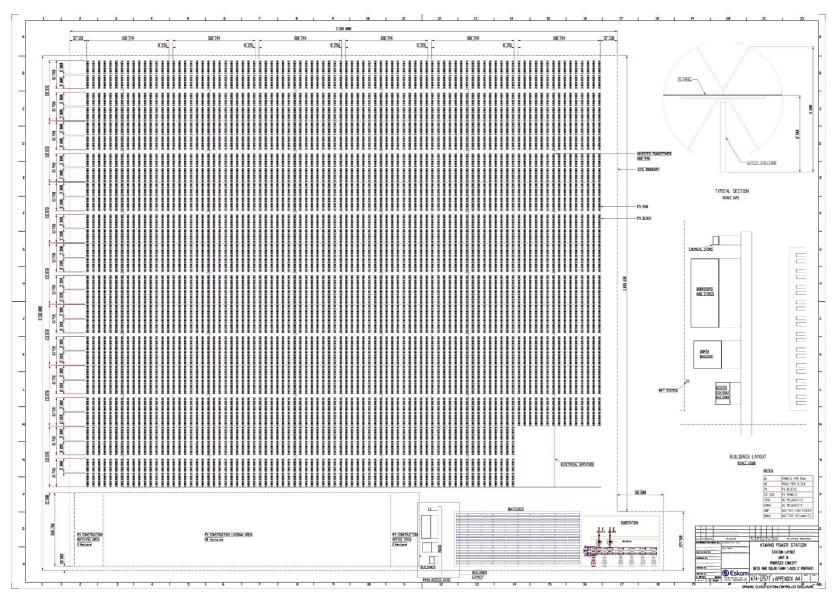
Proposed layout alternative for the single axis tracking PV structure
